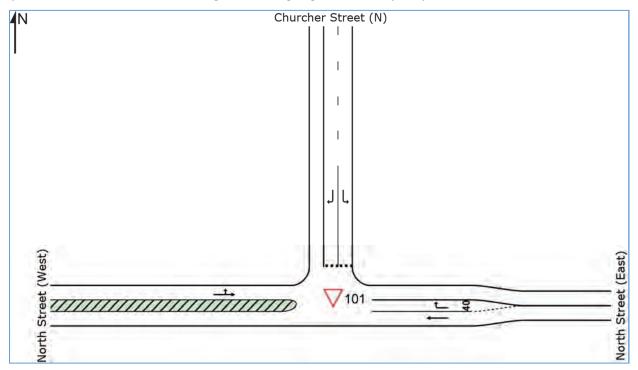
North Street / Churcher Street SIDRA Intersection Layout
